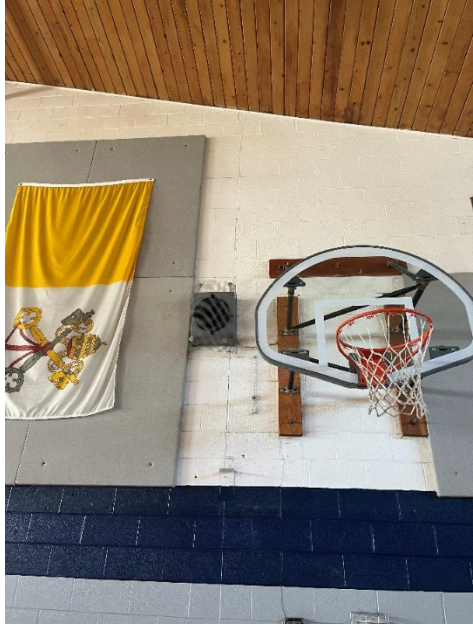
Crack in gymnasium extending beyond lintel
